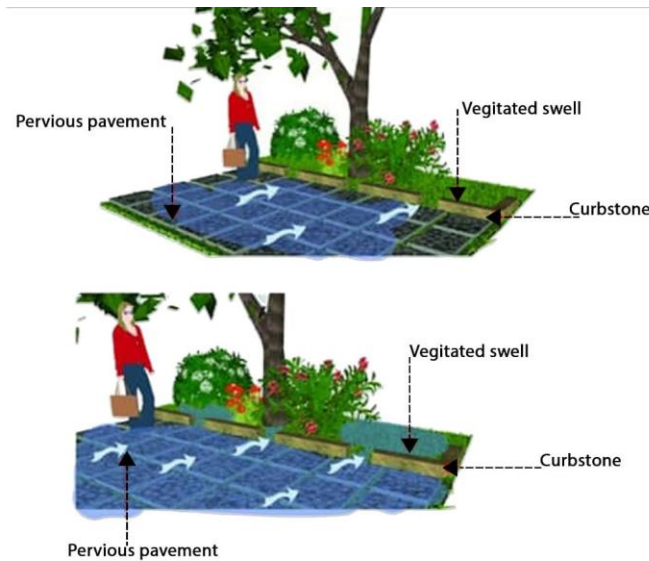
Communal open space pervious pavement and vegetated swale design at Lebu Varnero Apartments study area (Author, 2020)
